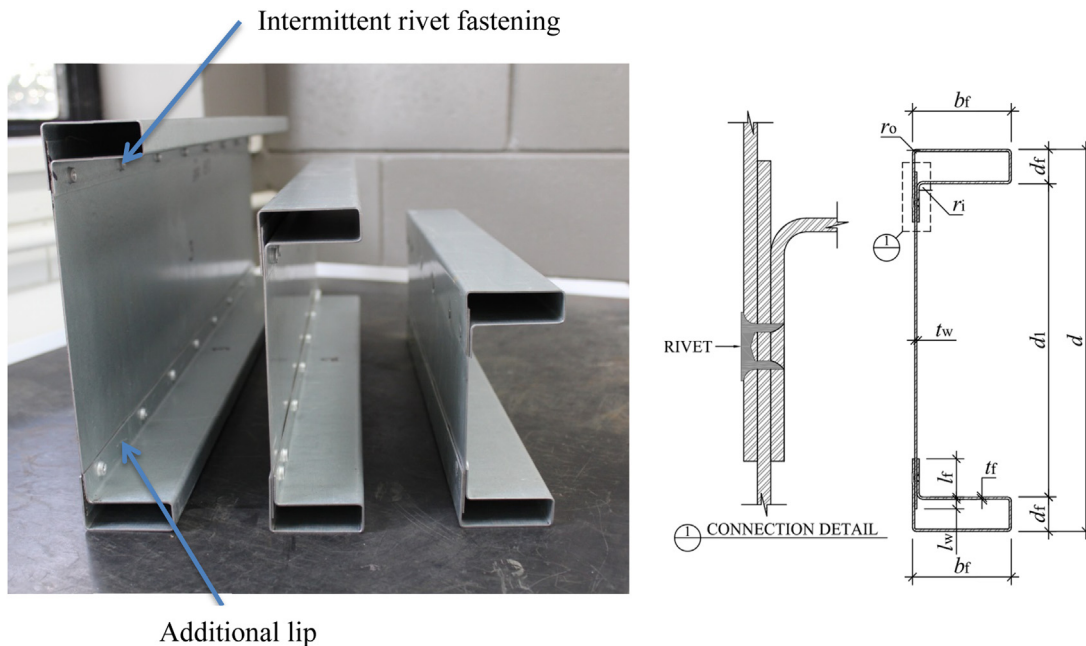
Rivet fastened rectangular hollow flange channel beam.
